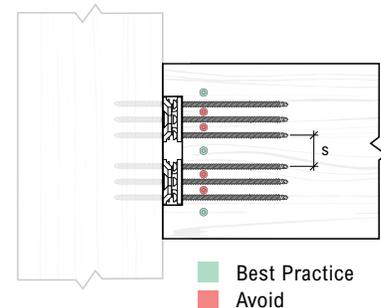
Reinforcing Screw Placement for Avoiding Screw Collisions
